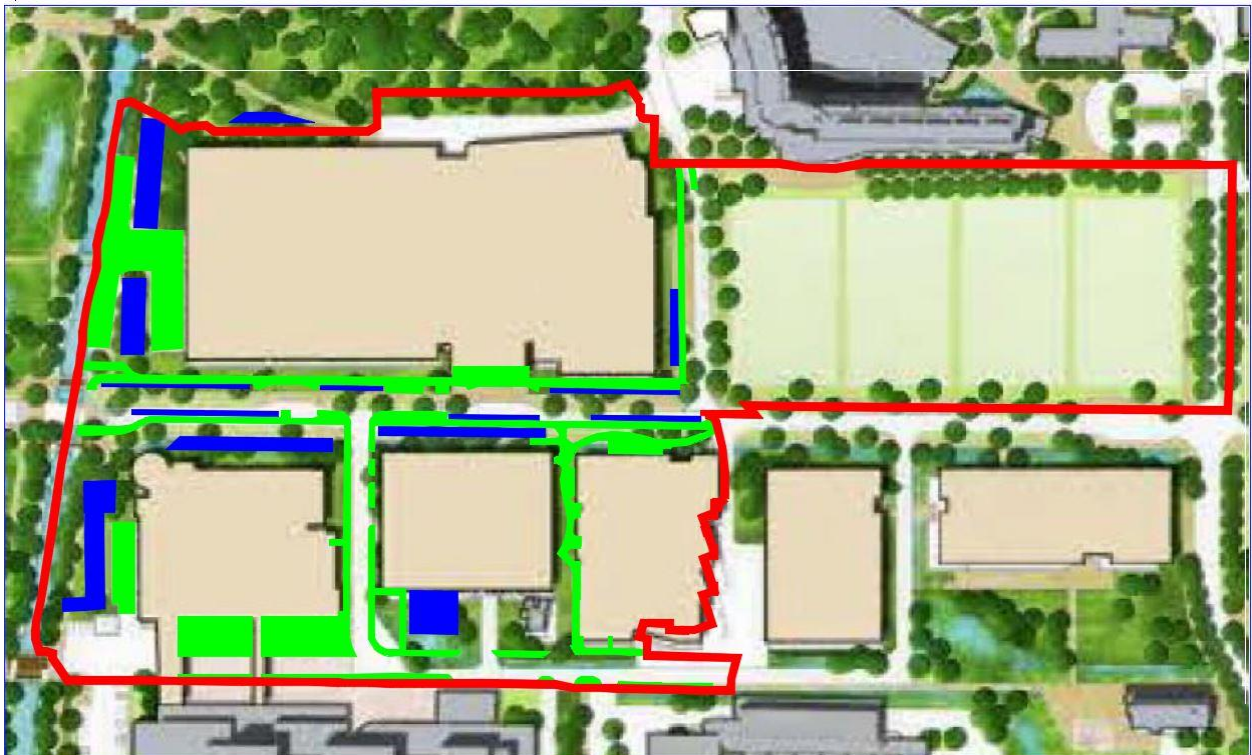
Conceptual plan for campus showing proposed land cover in study area. Potential biofilter locations shown in blue; potential permeable pavement sidewalks shown in green.
